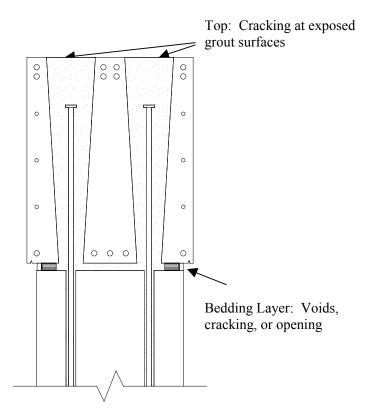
Durability Issues for Precast Bent Cap Systems
